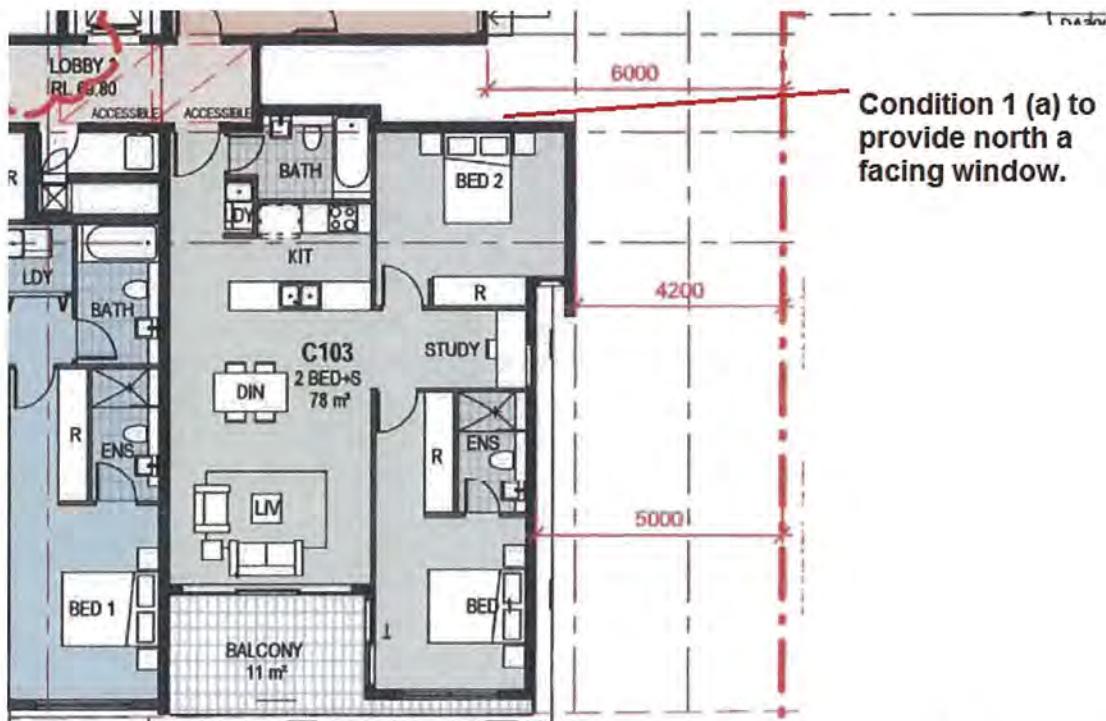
Typical layout of apartment C03. Condition 1(a) imposed to provide north facing window to bedroom 2 to improve solar access to the room.
